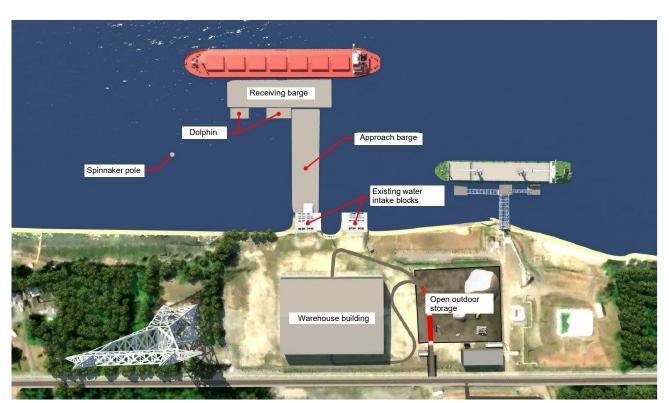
Conceptual drawing of the new floating dock on piles (plan view)
